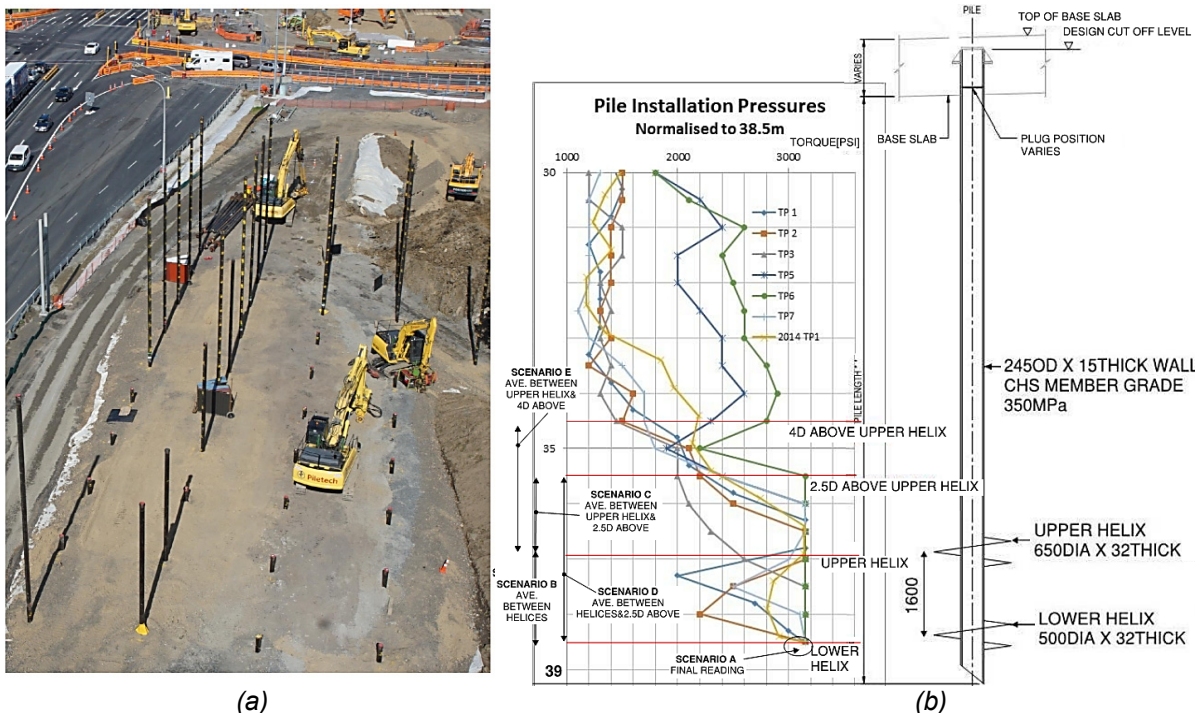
(a) Screw Pile Installation in April 2016; and (b) Test Pile Installation Pressures
